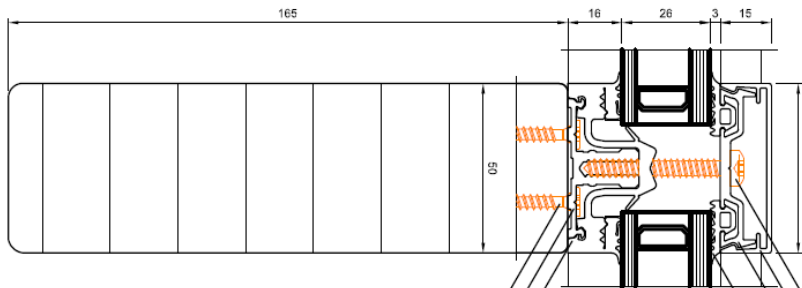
Glued-Laminated-Timber mullion and transom system (horizontal section)
